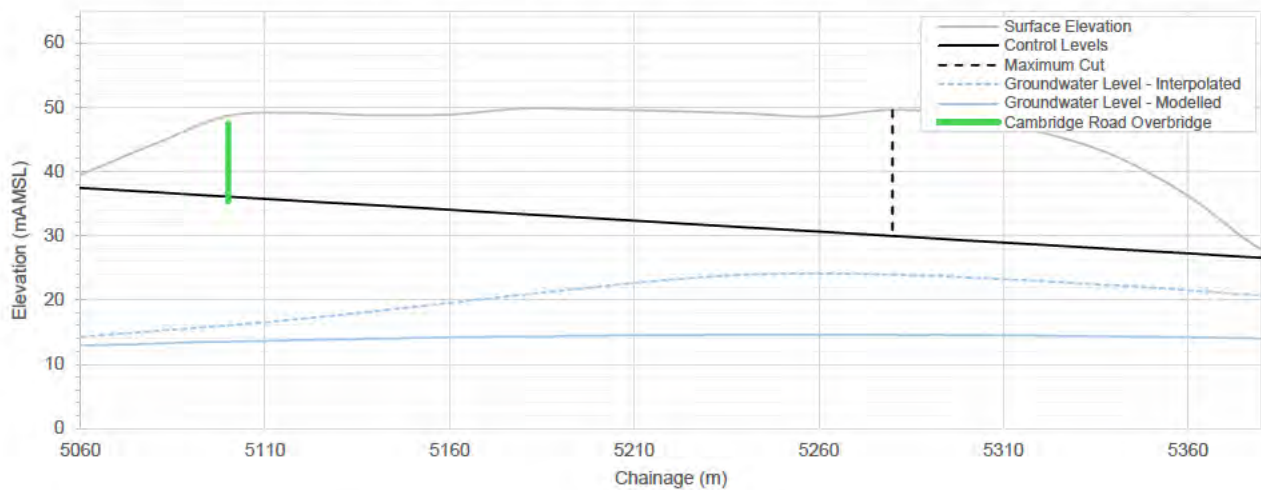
Long section along 5060 to 5380 m (SH29_Cut 6 and Cambridge Road Overbridge).
